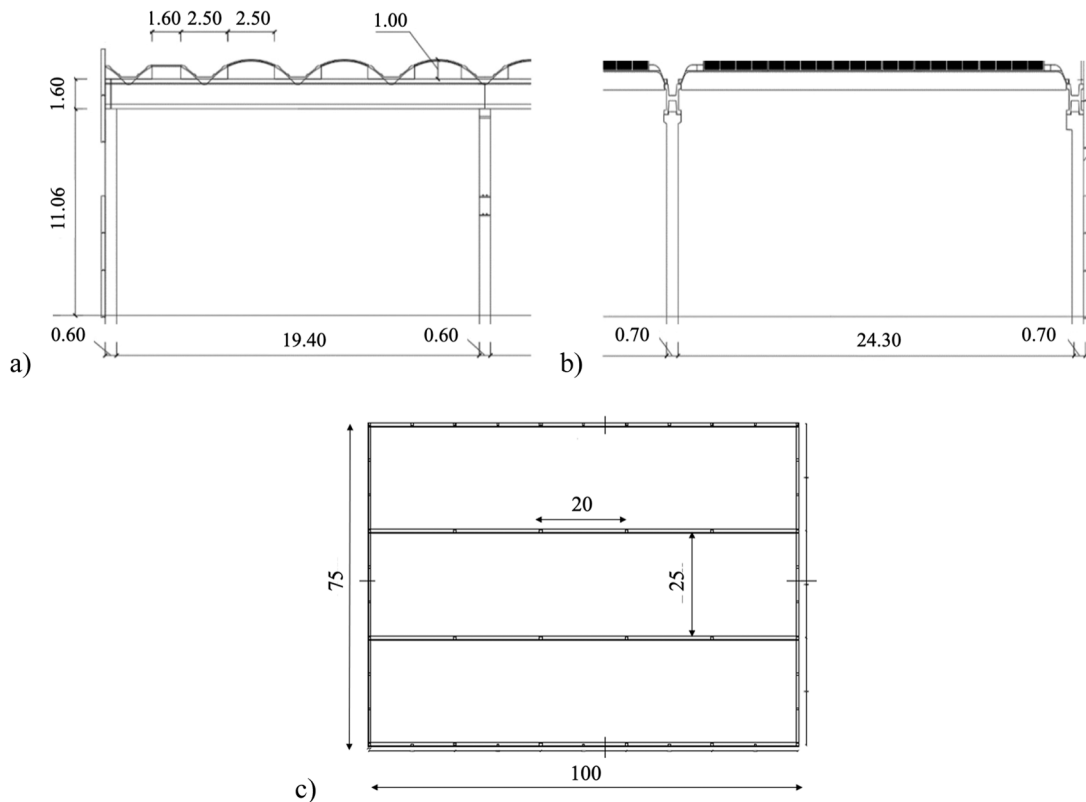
Building EE4 – (a) section view parallel to the wing-shaped roof elements (transverse direction), (b) section view parallel to the H-beams (longitudinal direction), and (c) plan view. (Units: m).
